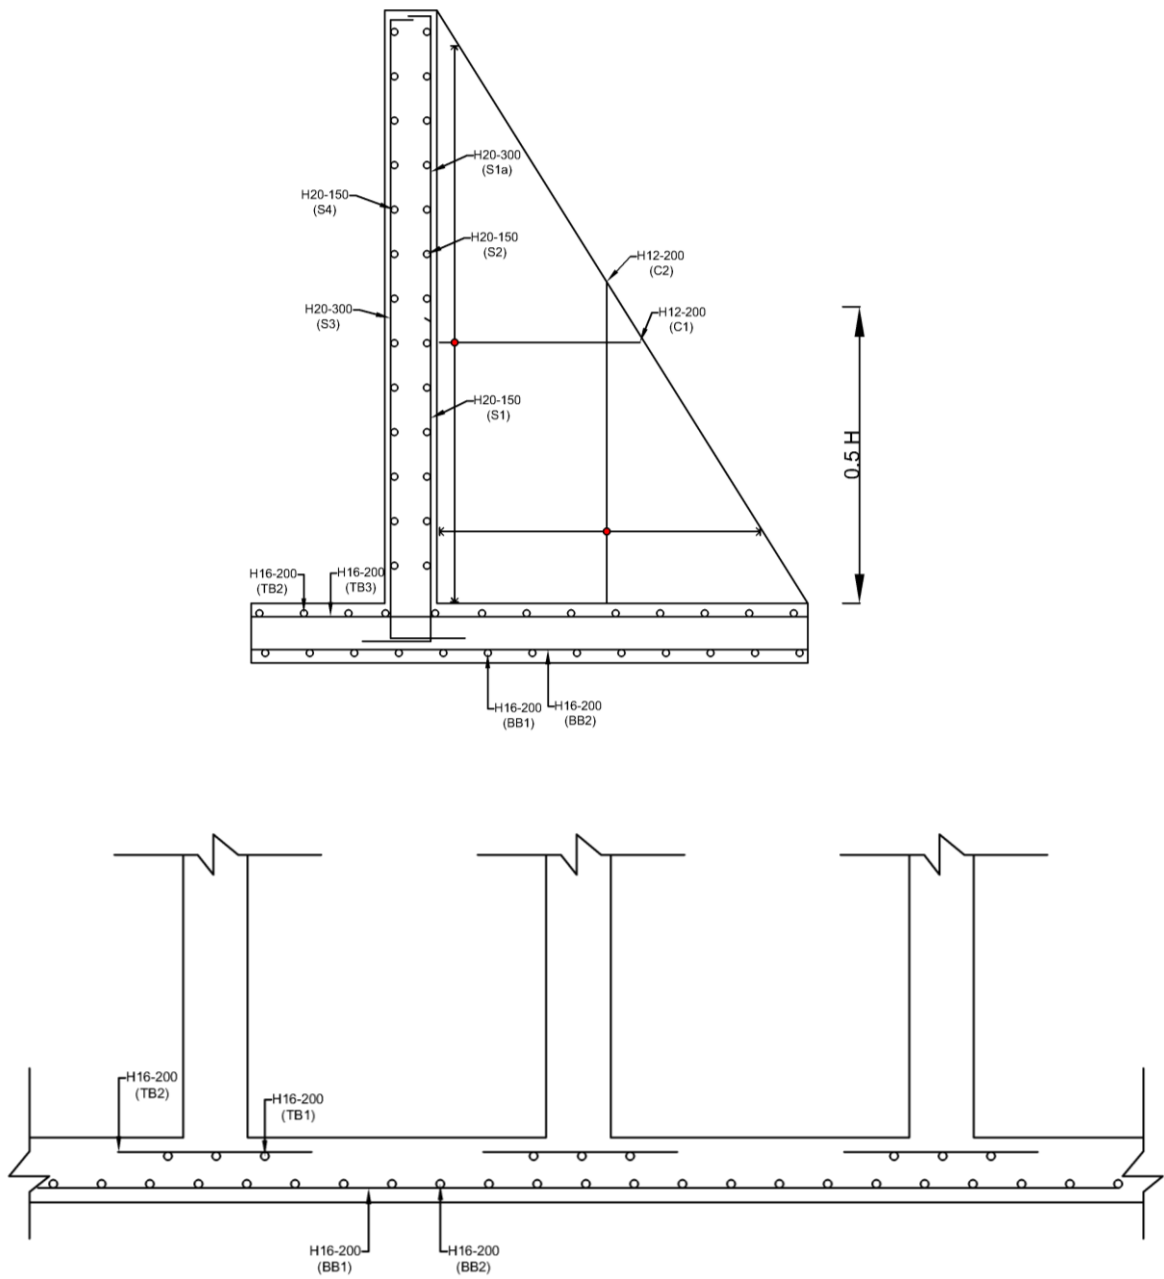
Detailing Drawing of Counterfort Retaining Wall of 11m height
